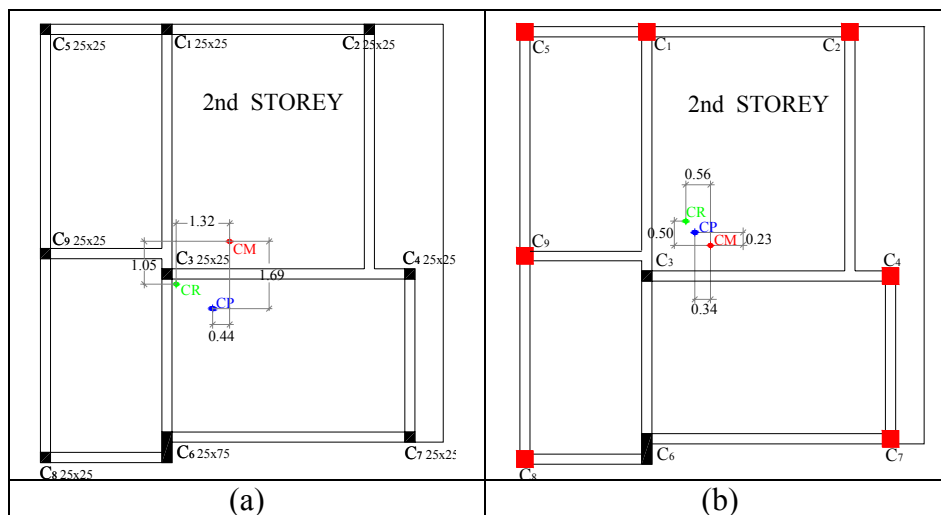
Eccentricity of stiffness and strength centre: ‘as-built’ structure (a); structure with RC jacketing of all square perimeter columns (b) (dimensions in meters)
